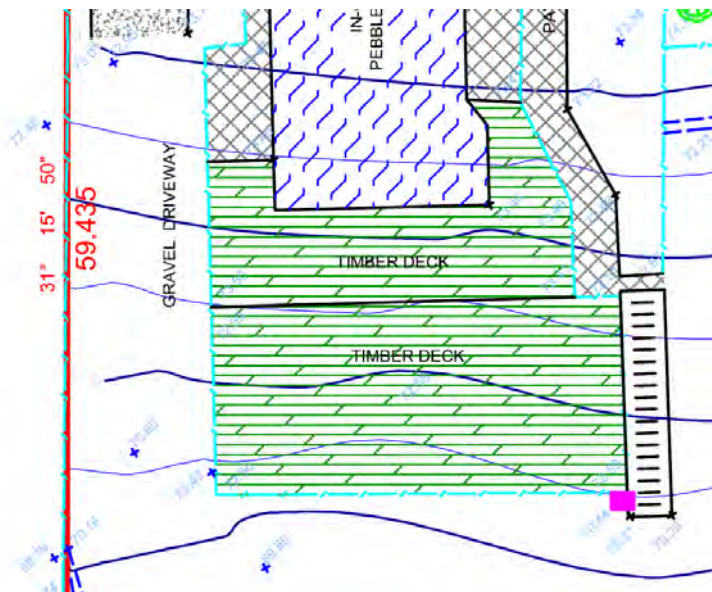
Extract from survey plan showing the rear deck located at 312 Blaxland Road
